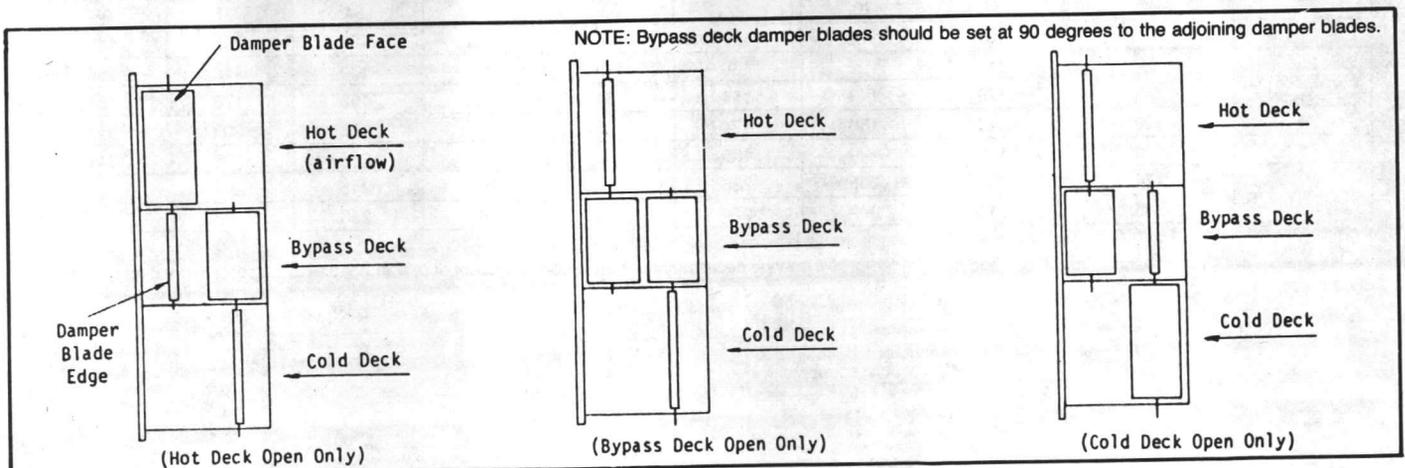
B - Proper Three-Deck Multizone Damper Blade Configuration
